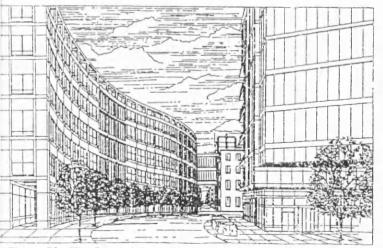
The Broomielaw. The proposed crescent south of the tower, facing west.
